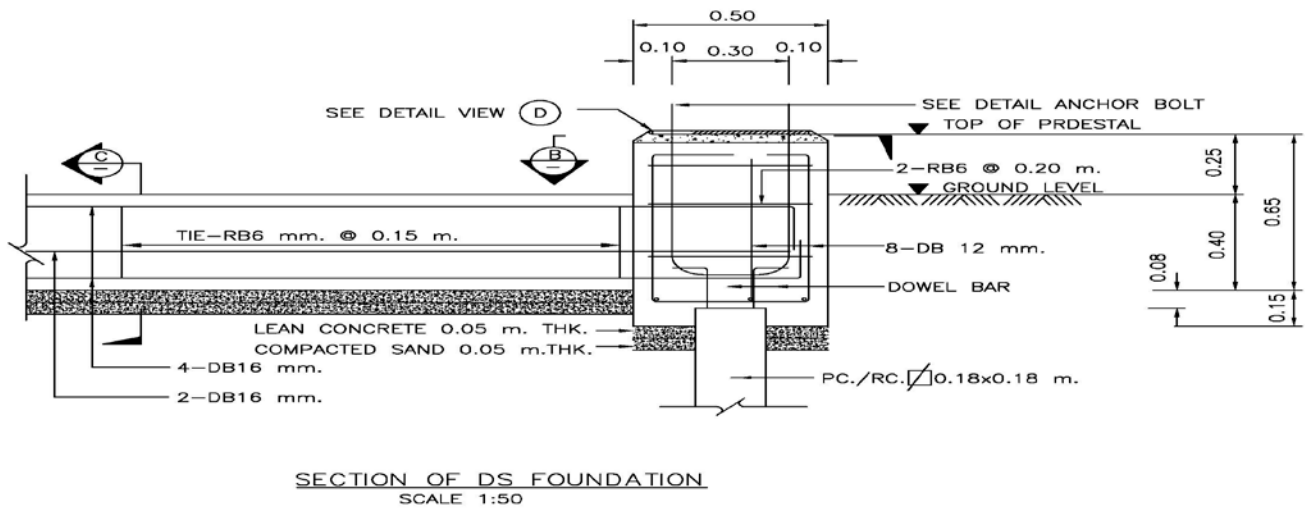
Lean concrete casting drawing of DS foundation
